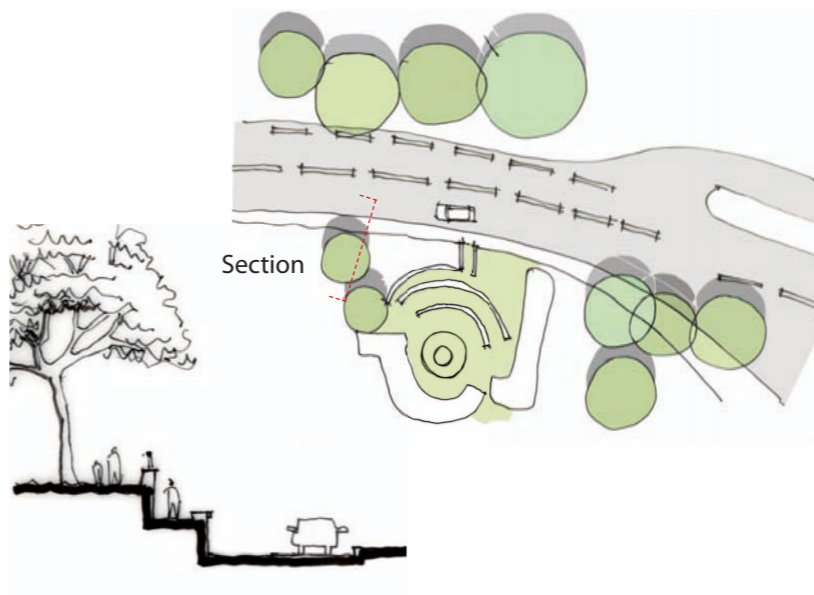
Indicative plan and section illustrate the road that follows the contours and circles around the outcrop at Daventry Town Centre
